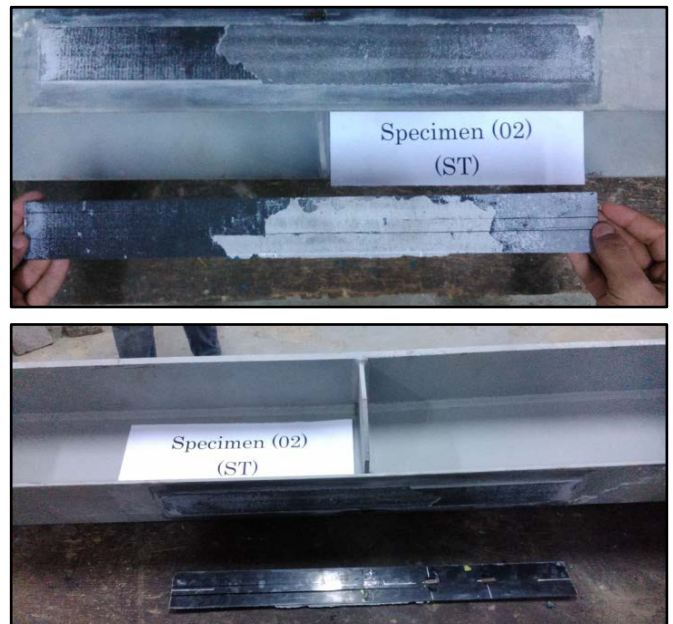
Failure mode of strengthened beam without end anchorage (ST)
